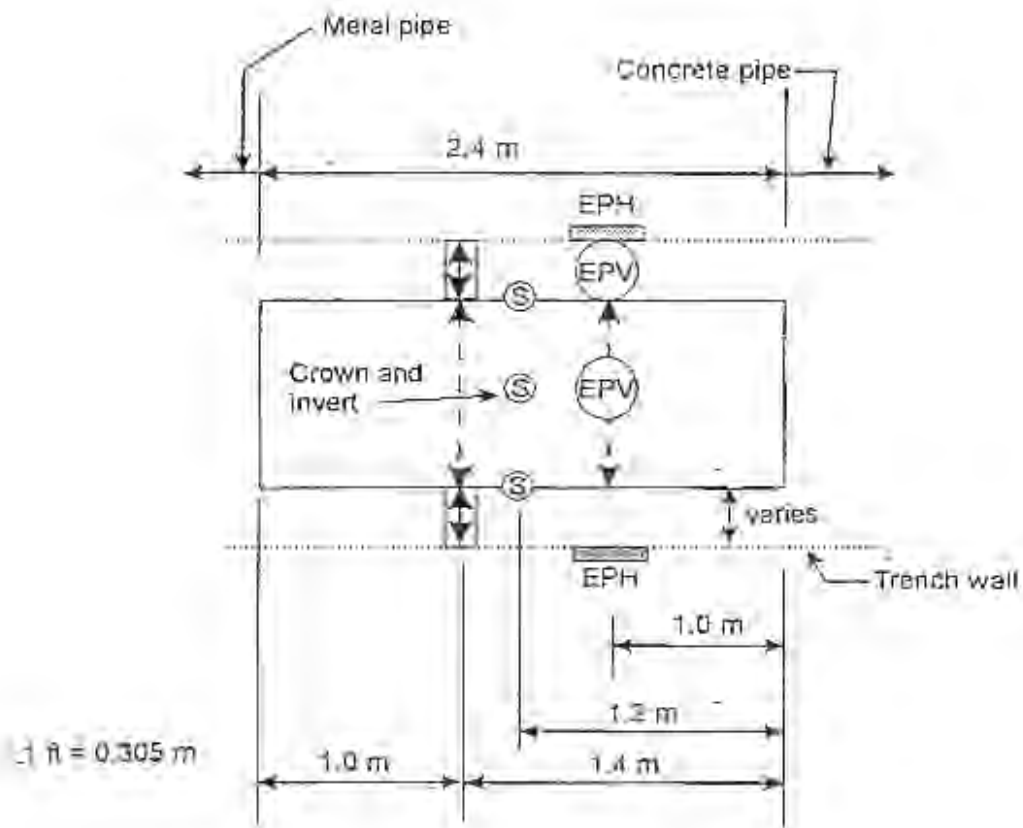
Cross-Section of Plastic Pipe in Trench with Instrumentation
